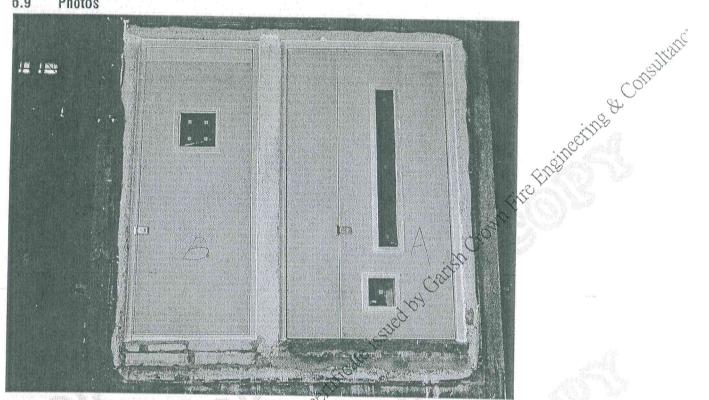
Exposed surface of the specimen before test. (Left: Door B; Right: Door A)
